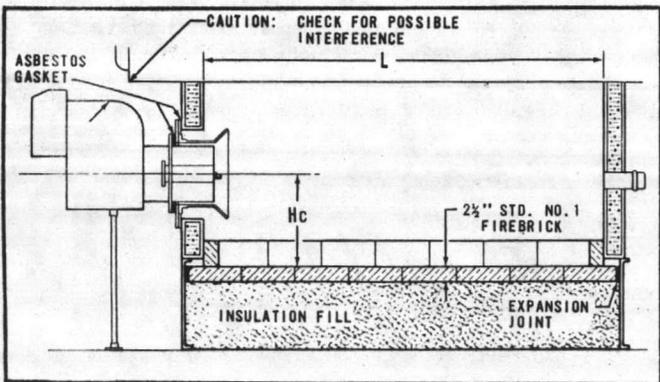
TYPE "R" BURNER INSTALLATION WITH REFLECTOR FRONTPLATE
